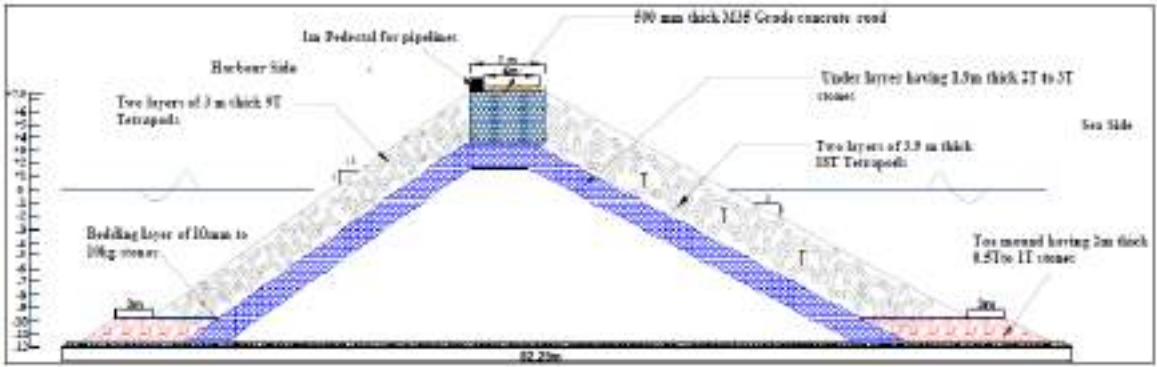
Typical breakwater trunk section for water depth of 10m to 12m
